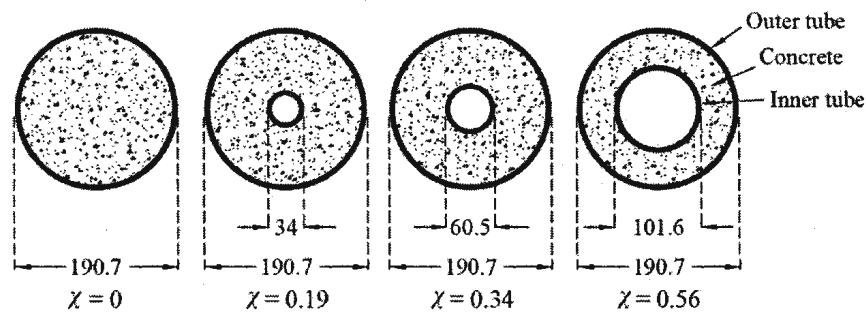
Typical cross-sections of specimens (unit: mm)
